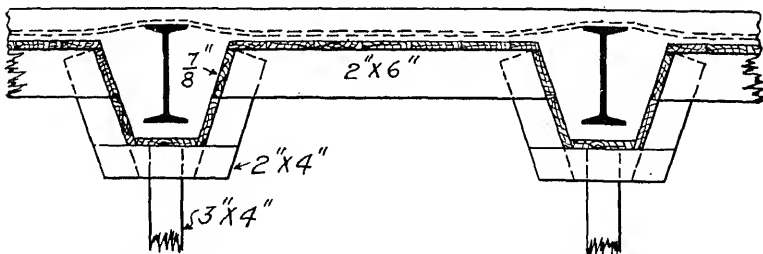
Forms for Reinforced Concrete Slab Supported by I-Beams
